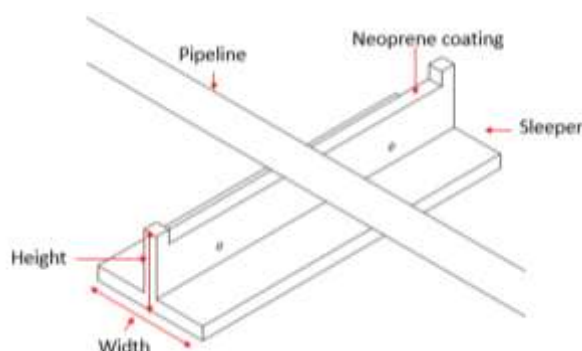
Typical Concrete Sleeper at Pipeline Crossing
